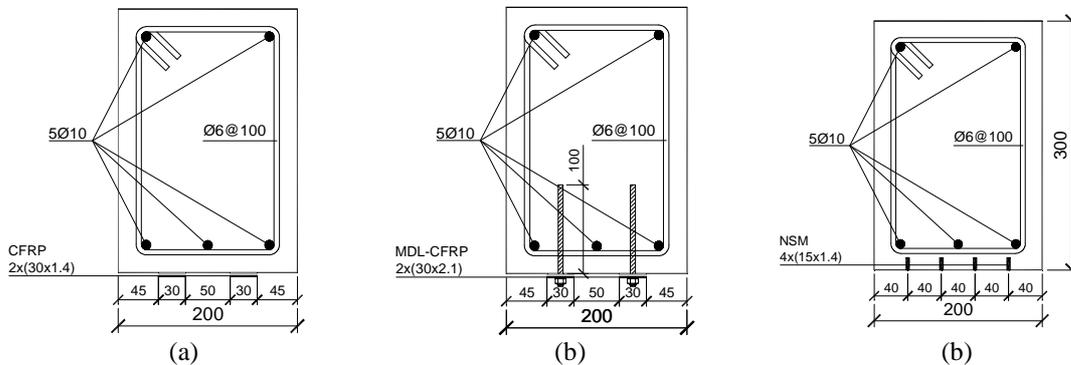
Strengthened beams cross section: (a) EBR; (b) MF-EBR; (c) NSM. Note: all units in [mm].
